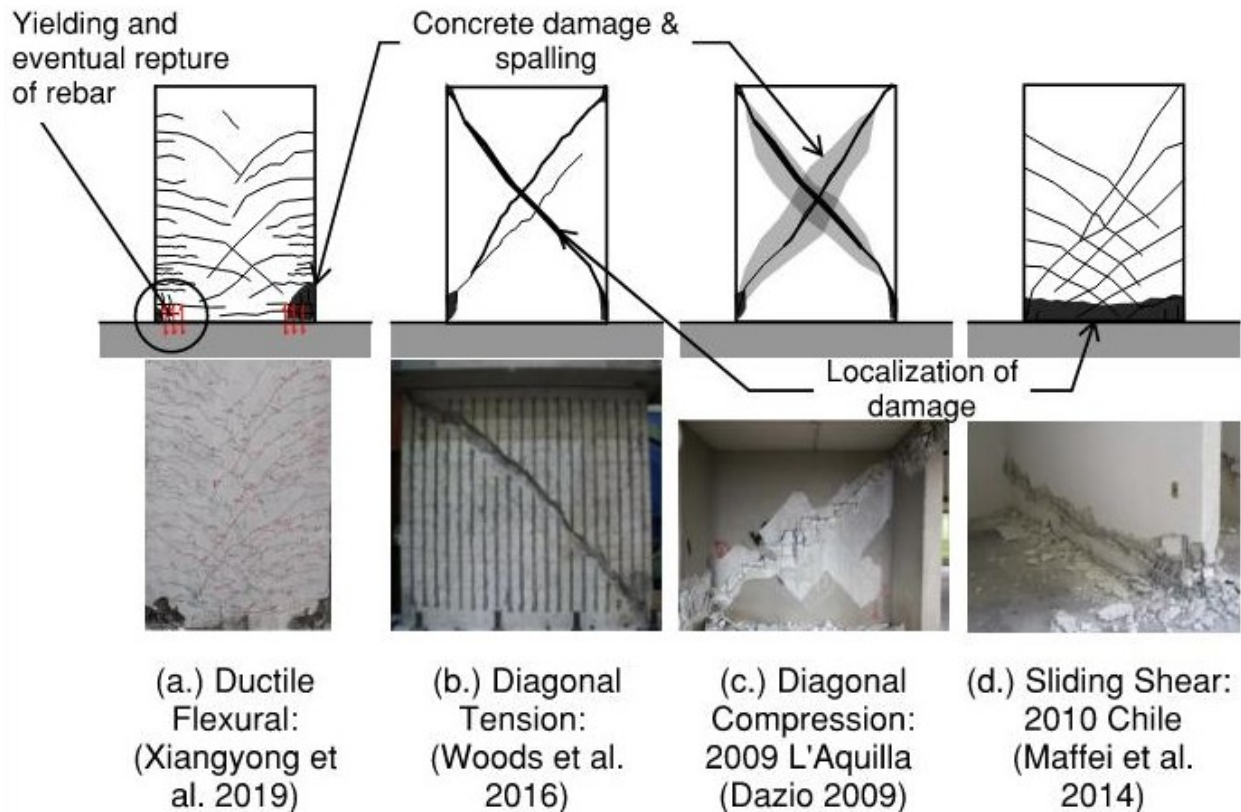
Typical RC Shear Wall Damage Patterns
